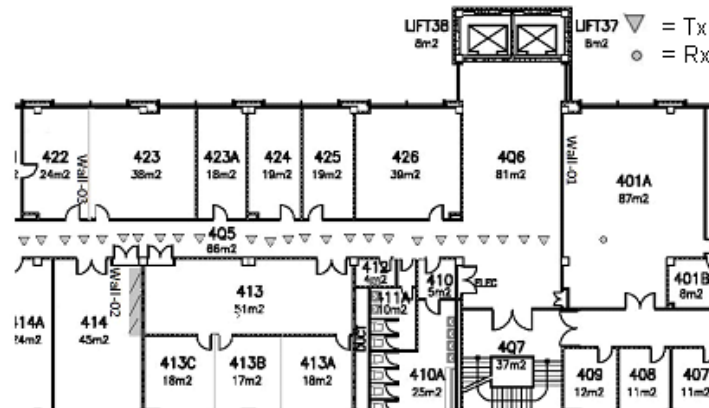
Floor Plan of 4th Floor EE Building showing Transmitter Distance from Wall.
